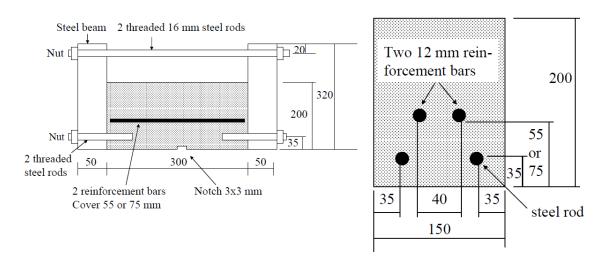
The concrete beam as seen from the side (left) and a cross-section (right), illustration from [3]. The formwork of the concrete beam is shown in Figure 2.
